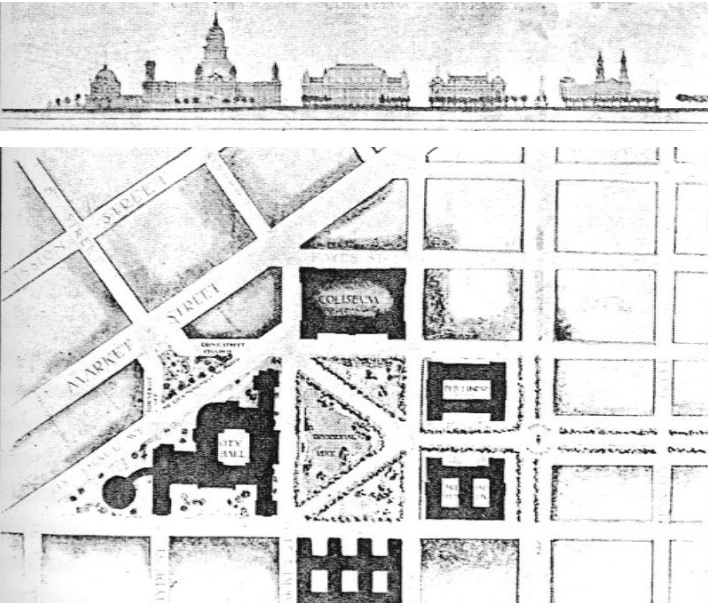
B.J.S. Cahill's 1904 section and plan for the Civic Center which was redrawn in 1909 (J. Tilman)
